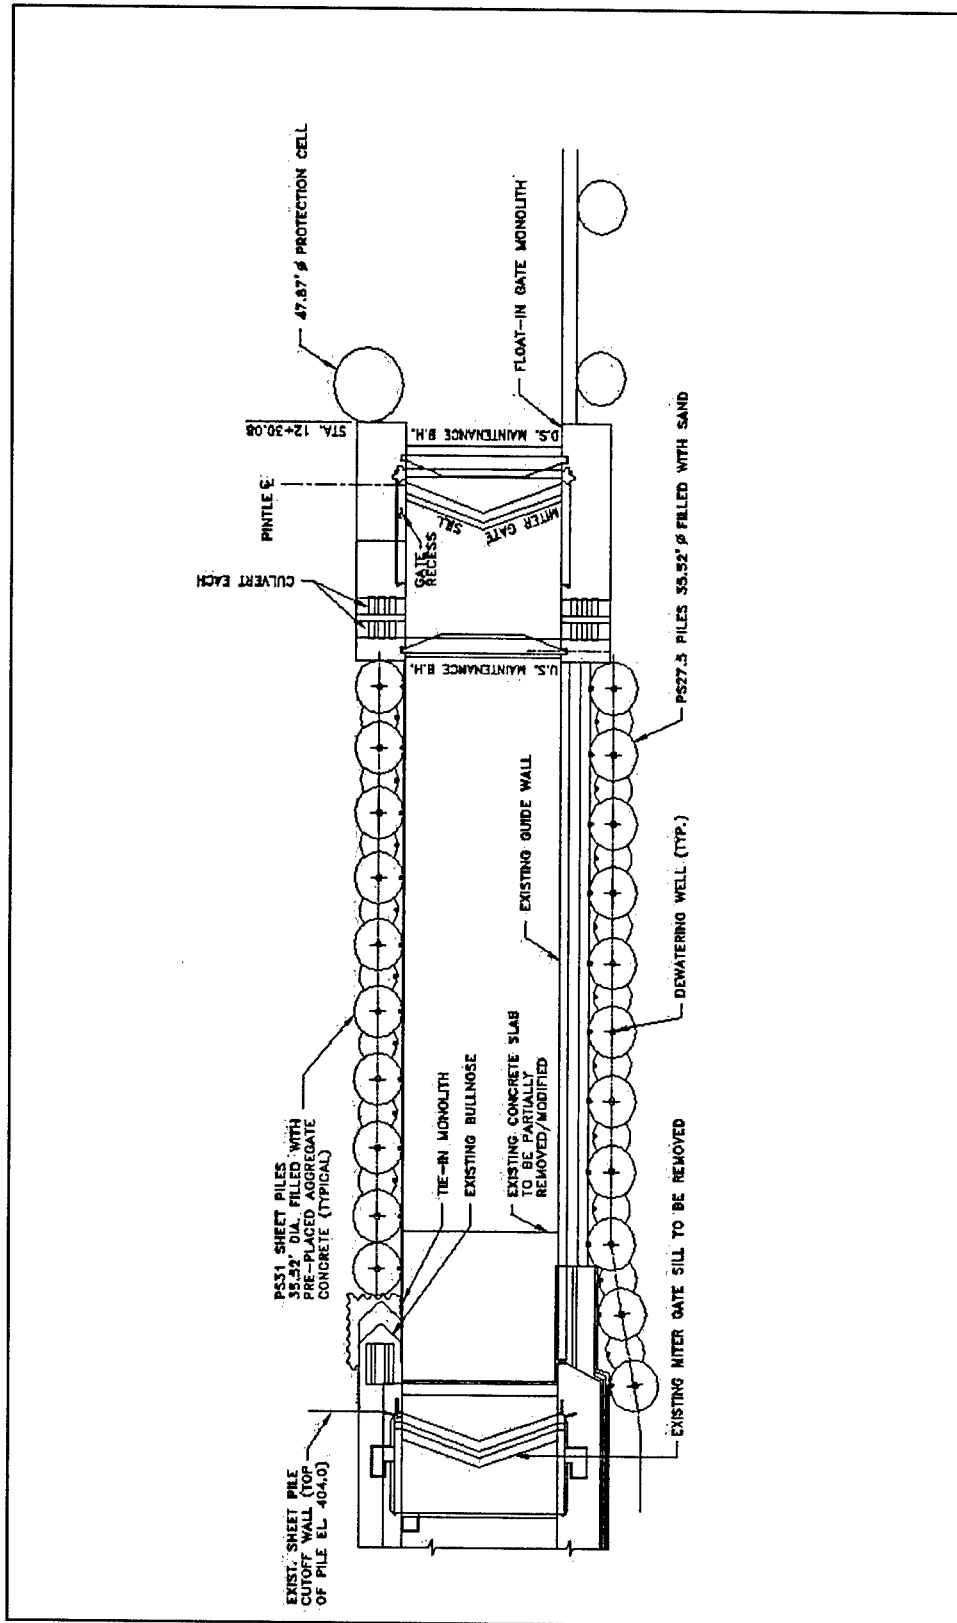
Plan 1, plan view of cellular wall extension of 600-ft lock
